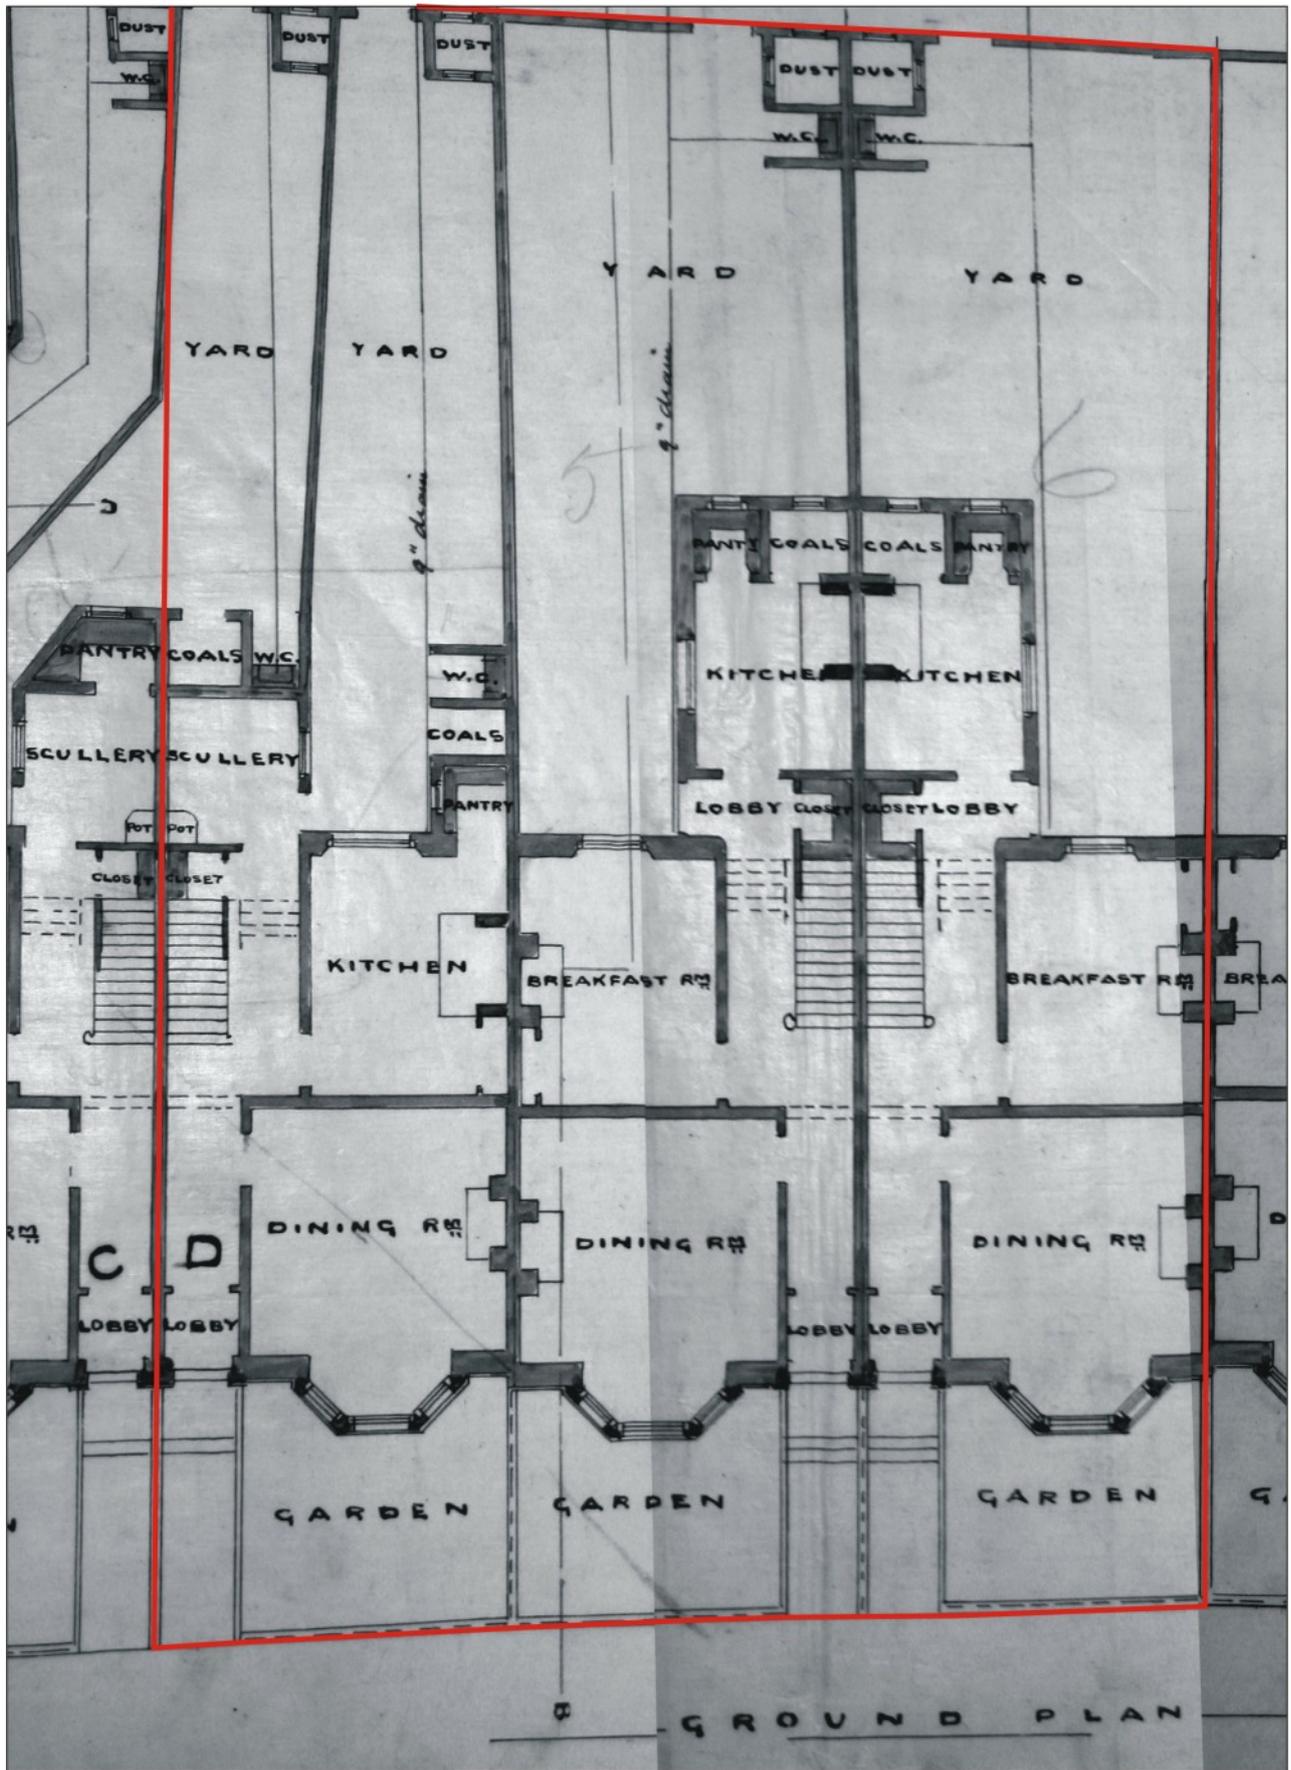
Dodds' 1870 plan "Plan of nine houses to be built at Cullercoats". Ground floor. Red line denotes site boundary.
